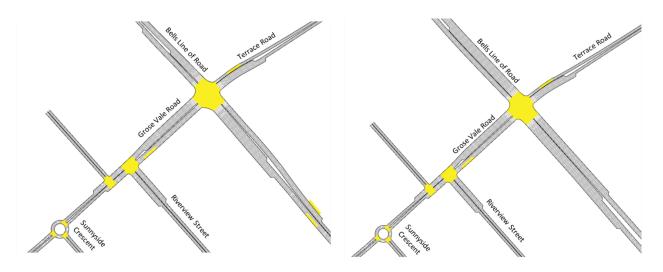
Bells Line of Road, Grose Vale Road, Terrace Road (Location 7) – Existing layout (left) and proposed upgrade (right)
